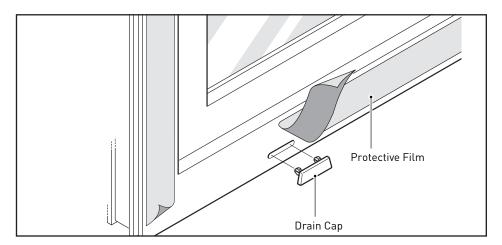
Remove the protective film and install the drain caps — exterior view
